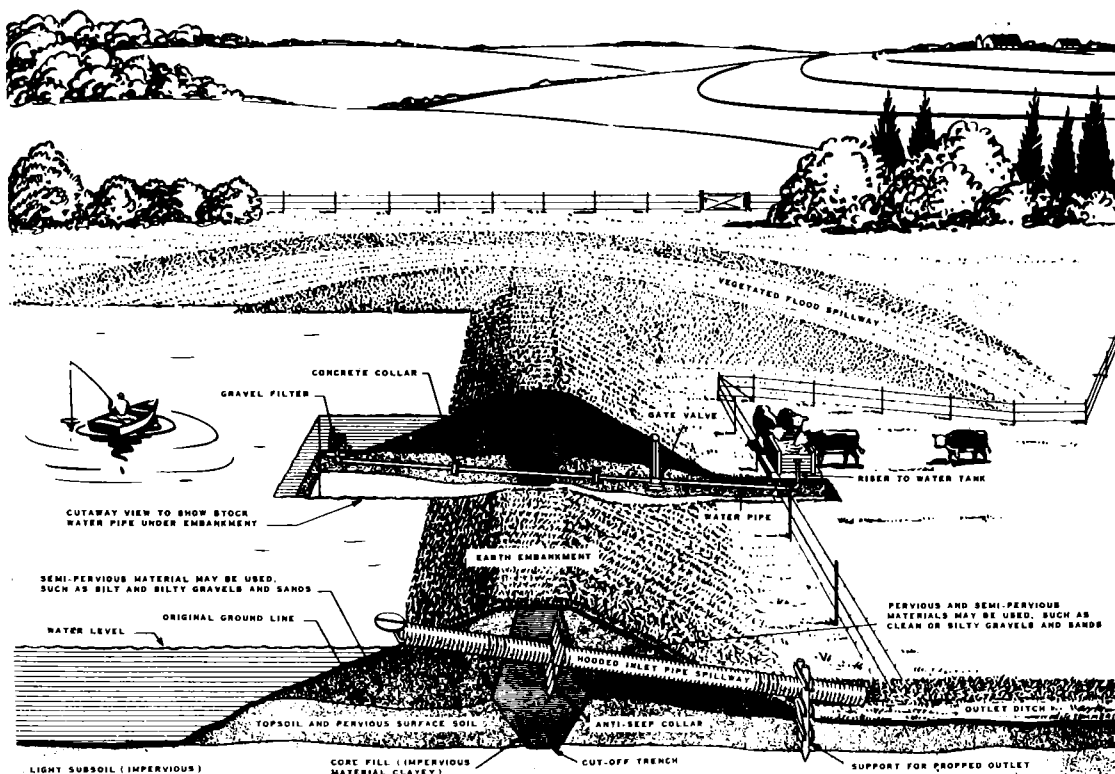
A well-designed farm pond with a separate outlet for watering cattle. (Source: Farmers Bulletin No.2256, USDA).
